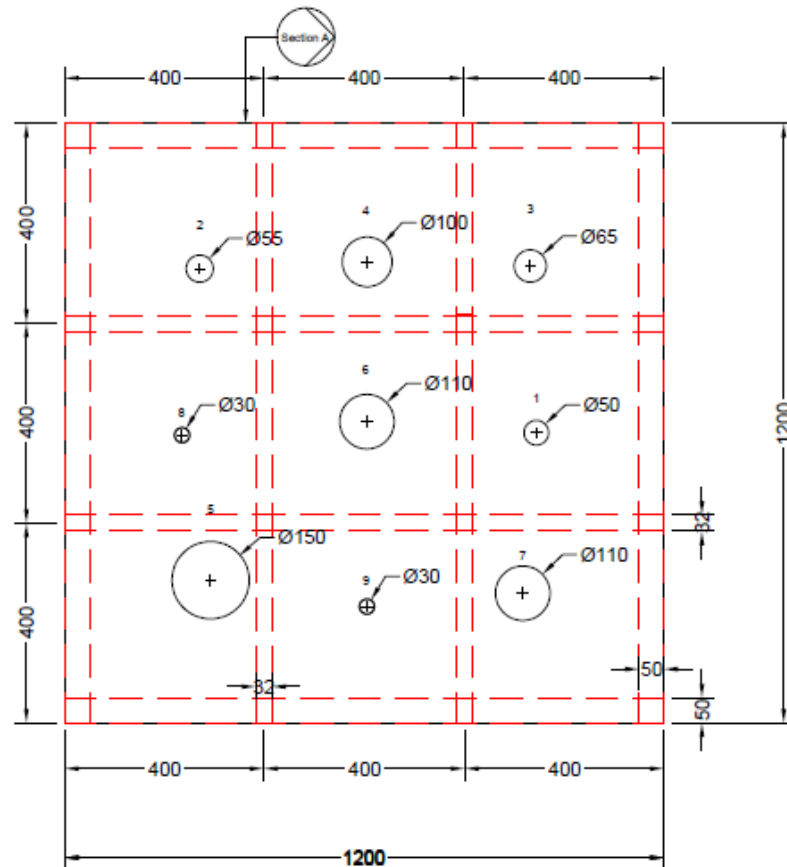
Test 6 – Elevation – Fire Side.pdf
